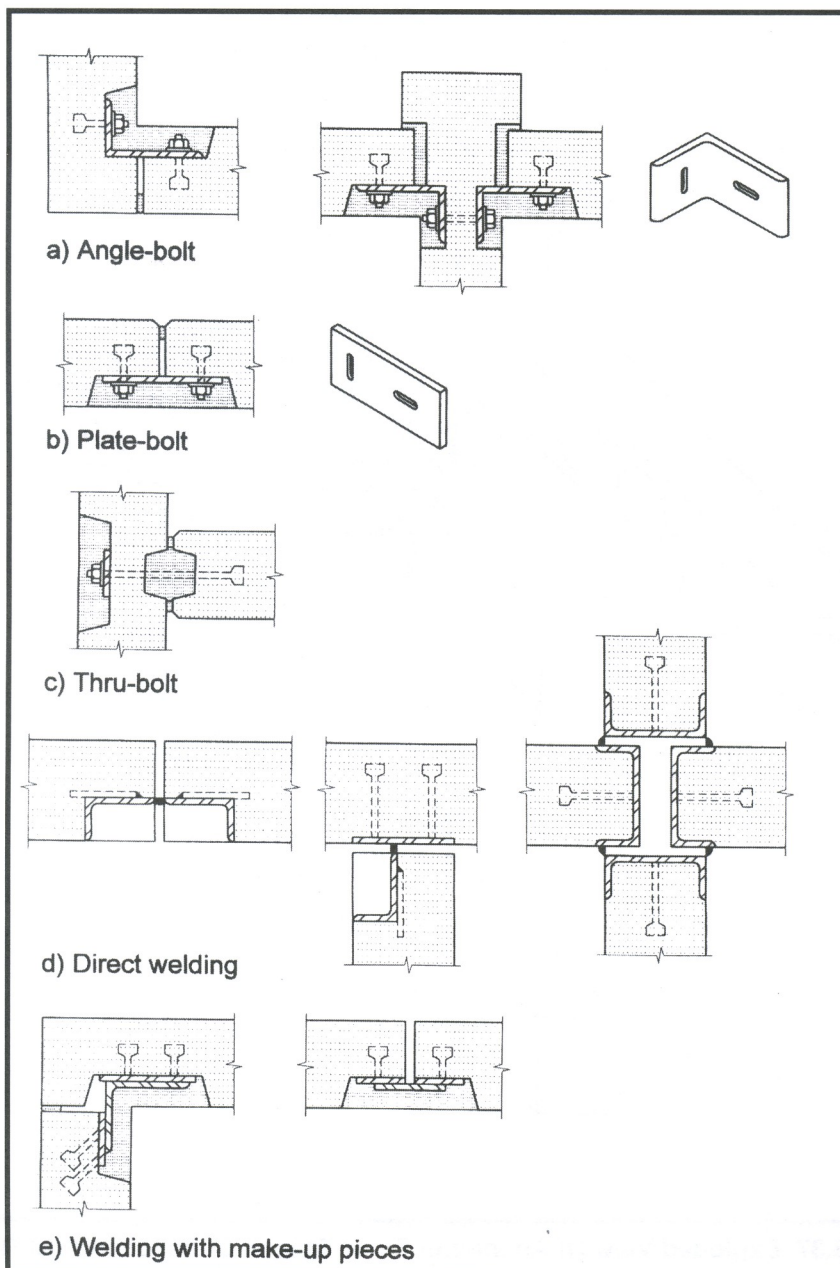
Mechanical Connection In Vertical Wall Joint (references 5 and 9)
